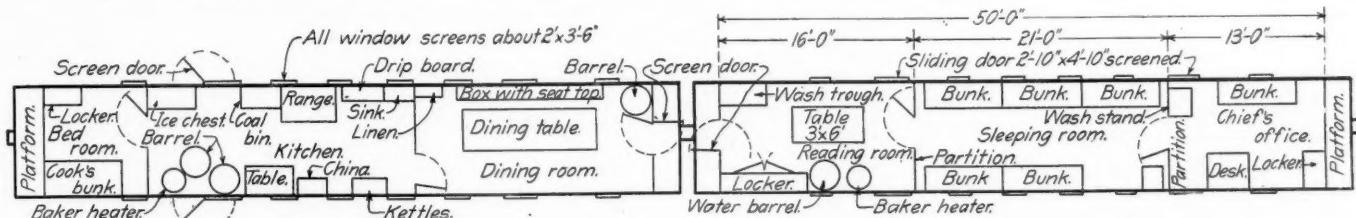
Floor Plan Showing Arrangement and Equipment of Sleeping and Dining Cars
